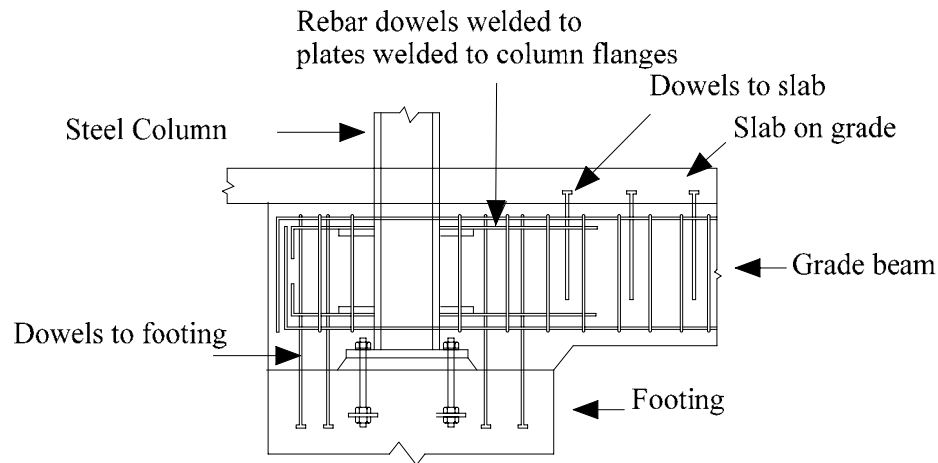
Junction embedded base plate in a grade beam with the footing [after Cochran (2003)]
